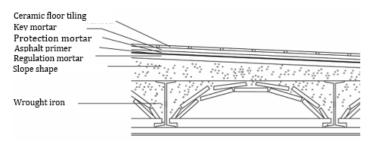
Construction detail of the roof implemented at Duclós House. Source: Preparation by the Authors.
